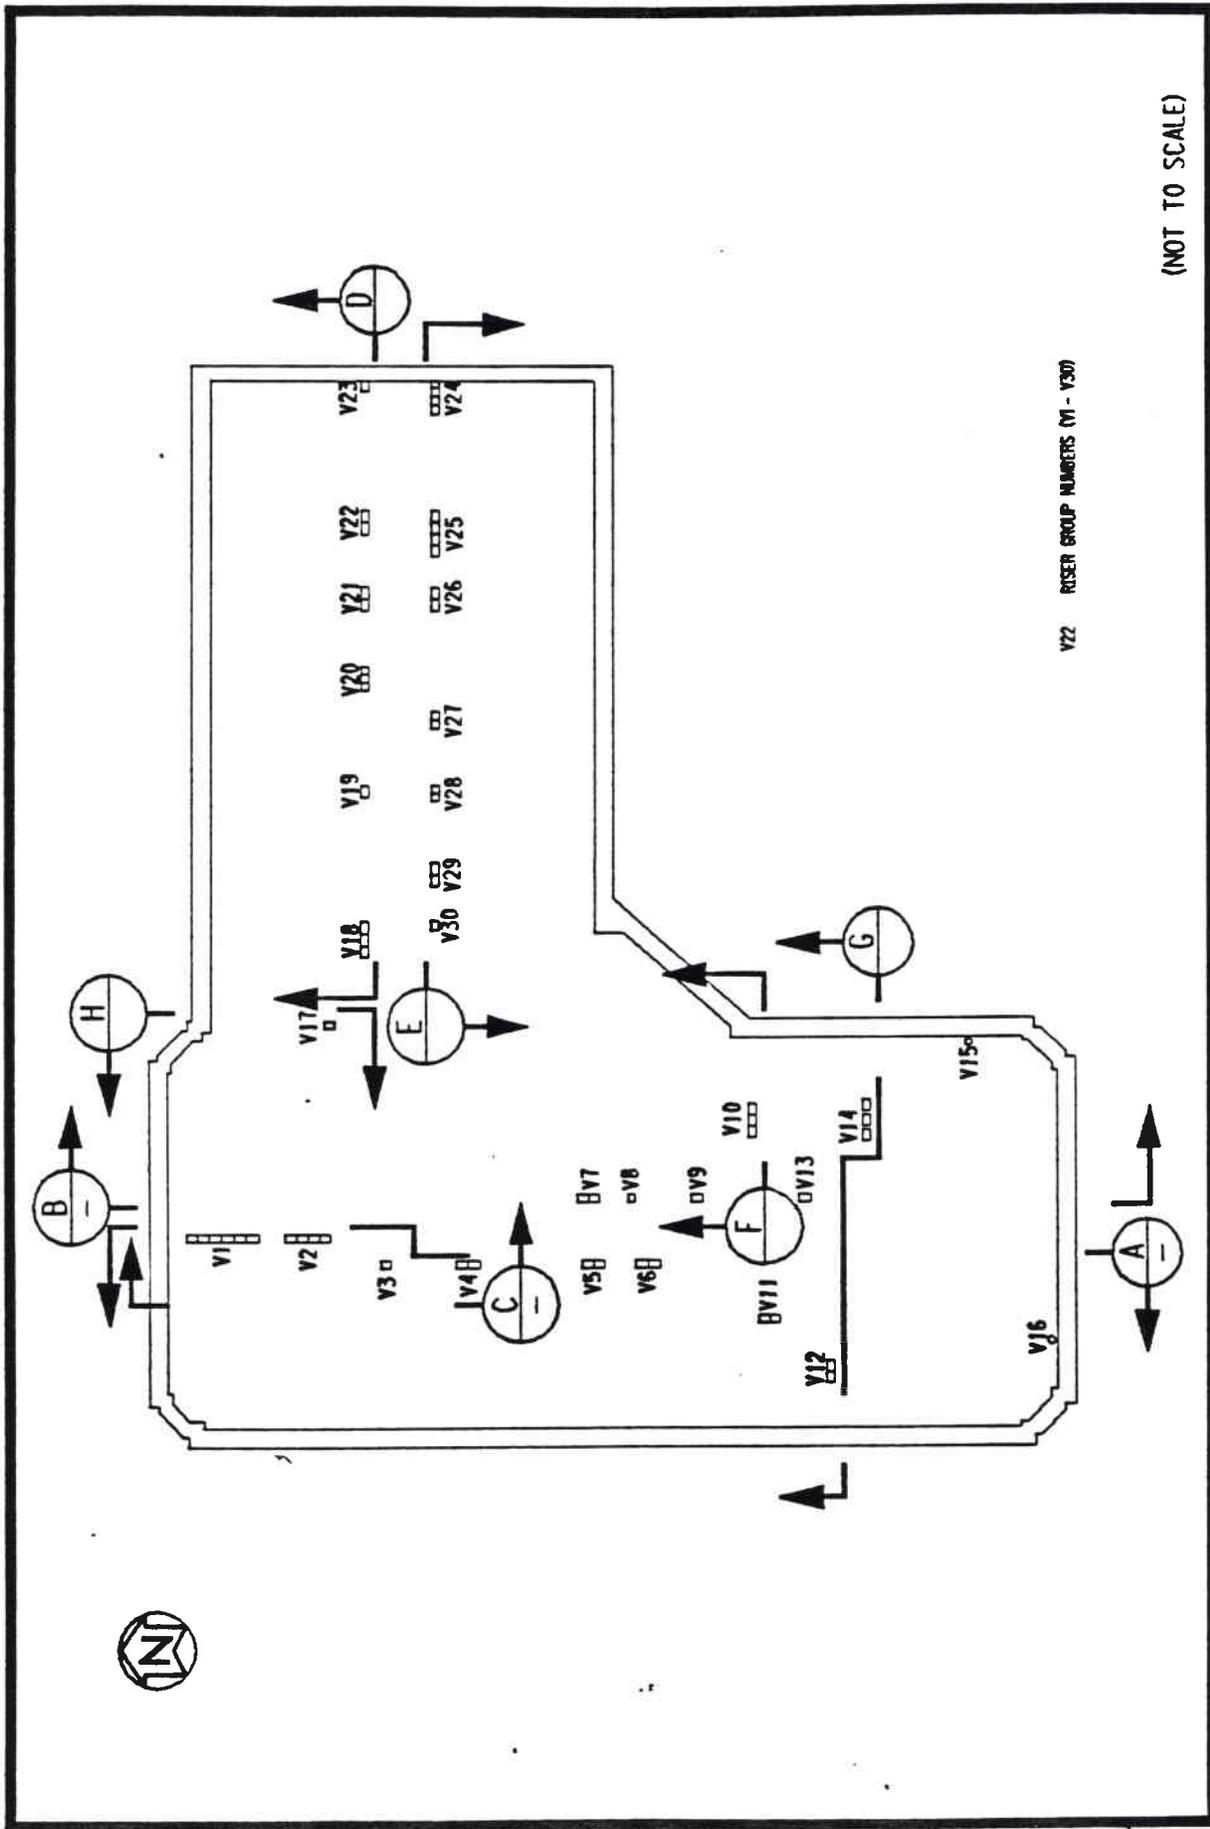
TYPICAL FLOOR PLAN OF THE JONES LABORATORY
